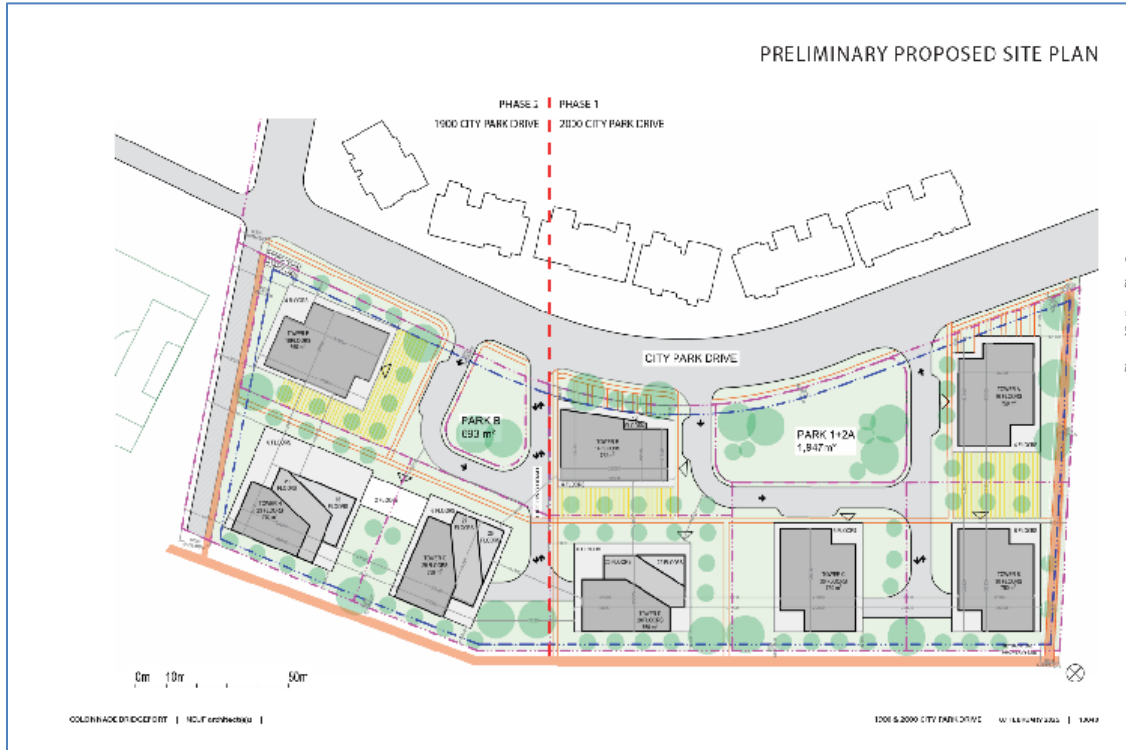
Preliminary Proposed Concept Plan presented to Urban Design Review Panel on February 7, 2025.
